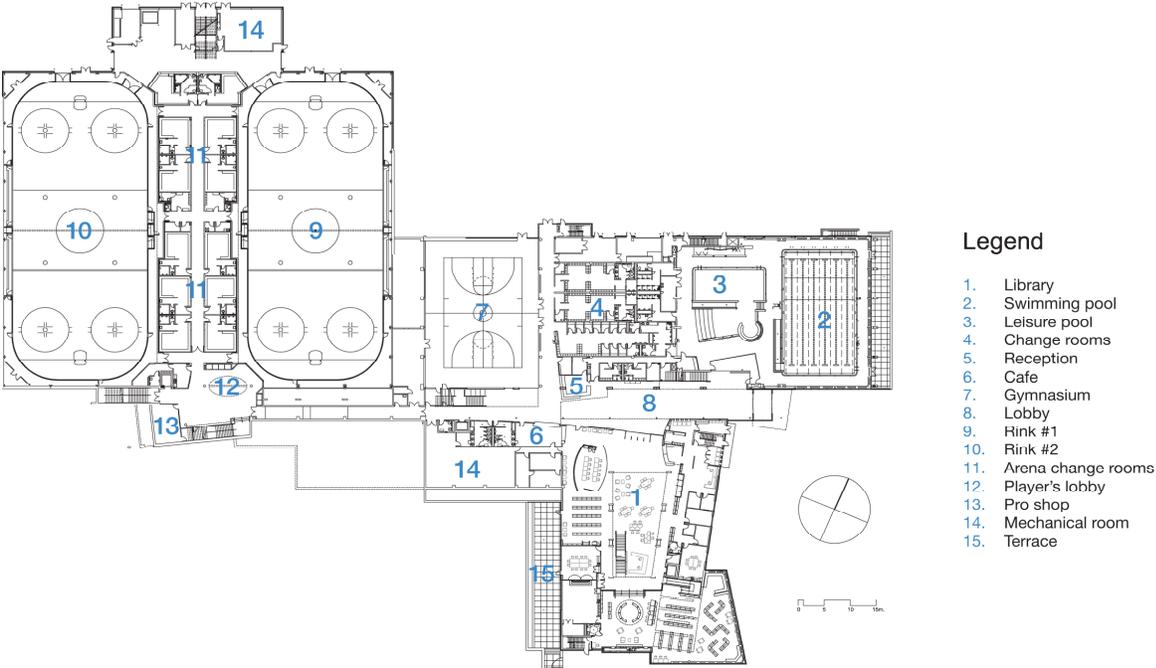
Ground floor plan of facility (www.cwc.ca, 2009)
